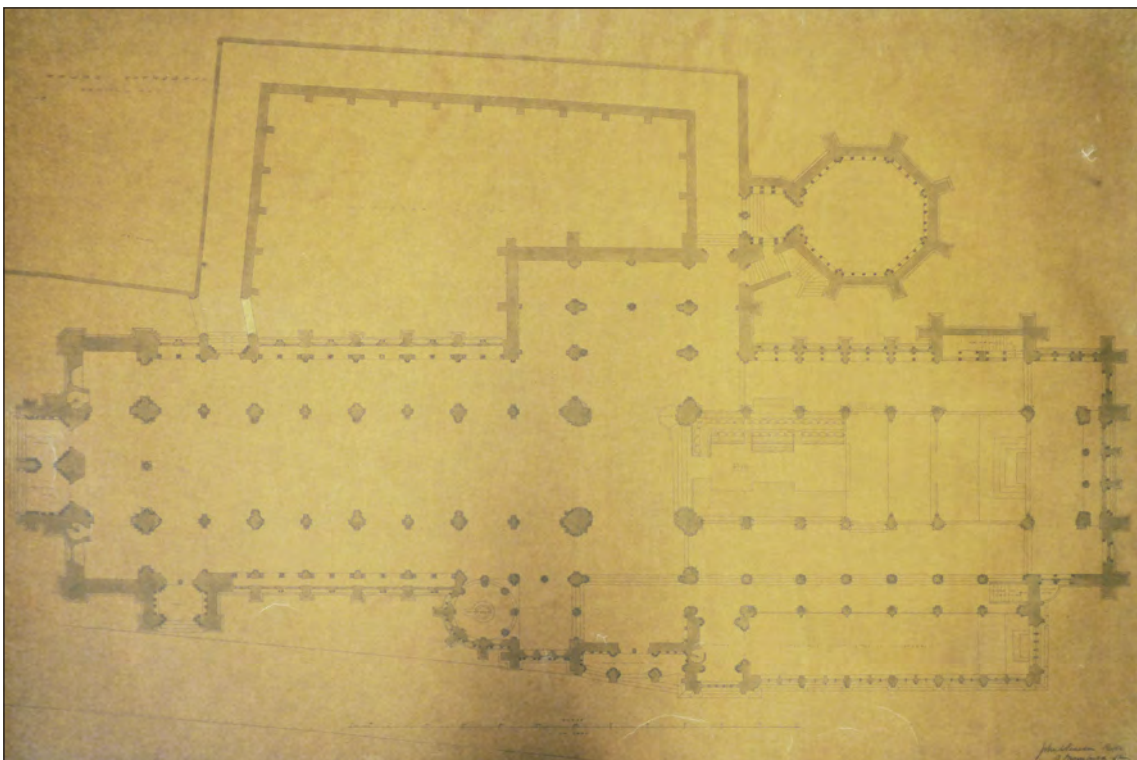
Ground-floor plan of Truro Cathedral, circa 1880 (D/P/1 © Cornwall Record Office)
